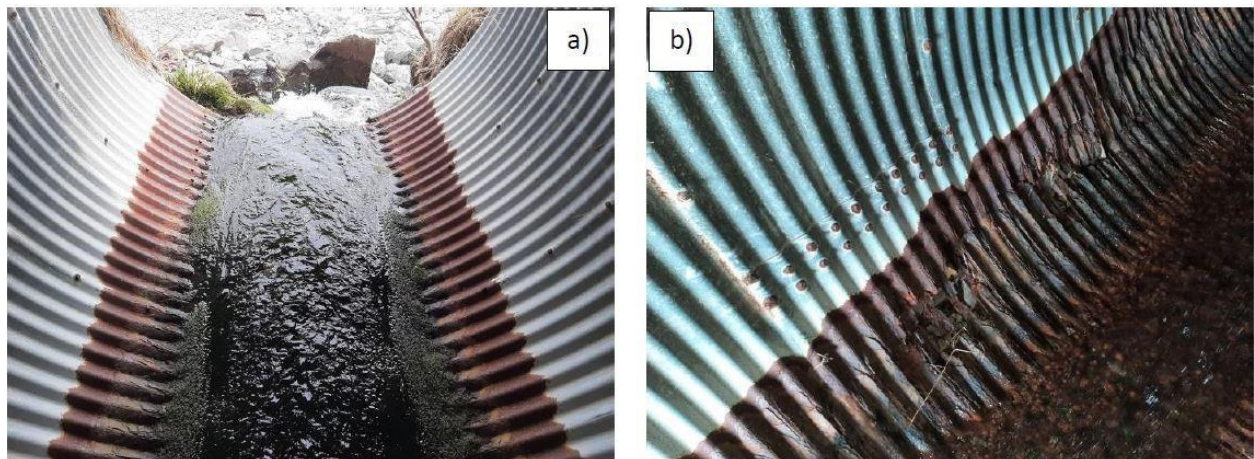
a) The bay-ward side of the culvert, looking south from inside the culvert. b) Close-up showing corrosion of rivet and pipe in the northern section of the culvert. (22 April 2021.)
